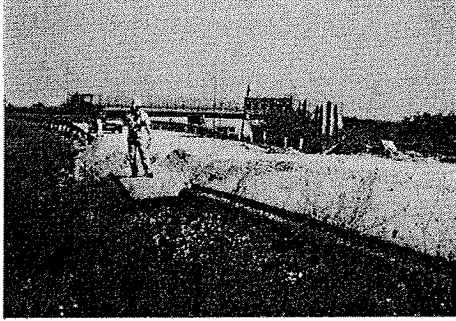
Minor Damage in an Overpass where the Fault Crossed the Overpass at the Abutment
